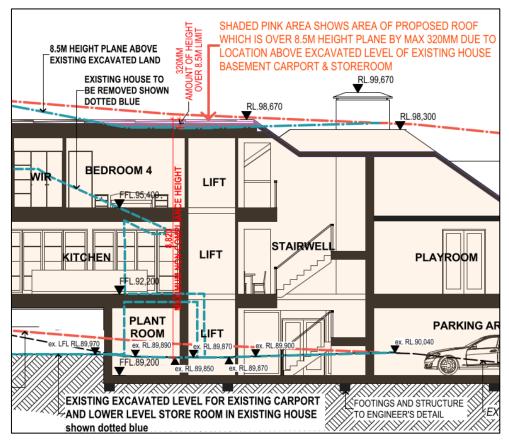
Shaded pink area of the height contravention over three-storey element proposed.
